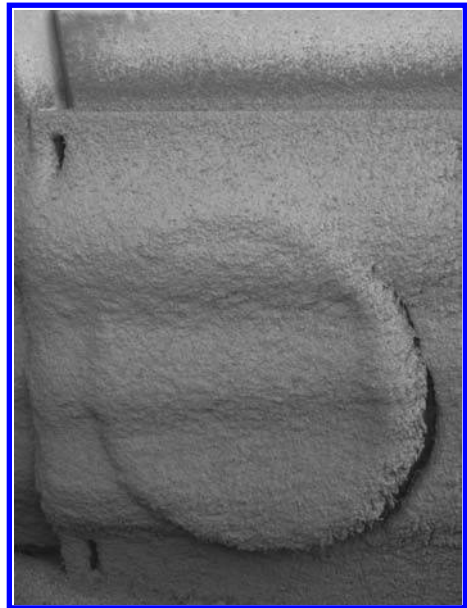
Sprayed ASTM C1550 Round panel prior to cutting back to flat surface.
